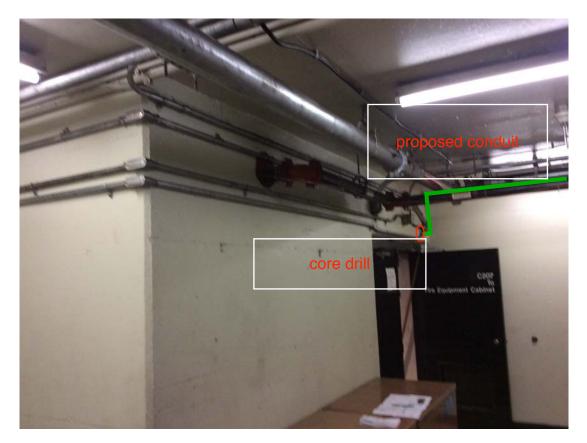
D05 Capitol South: Proposed overhead conduit and existing in floor duct runs
